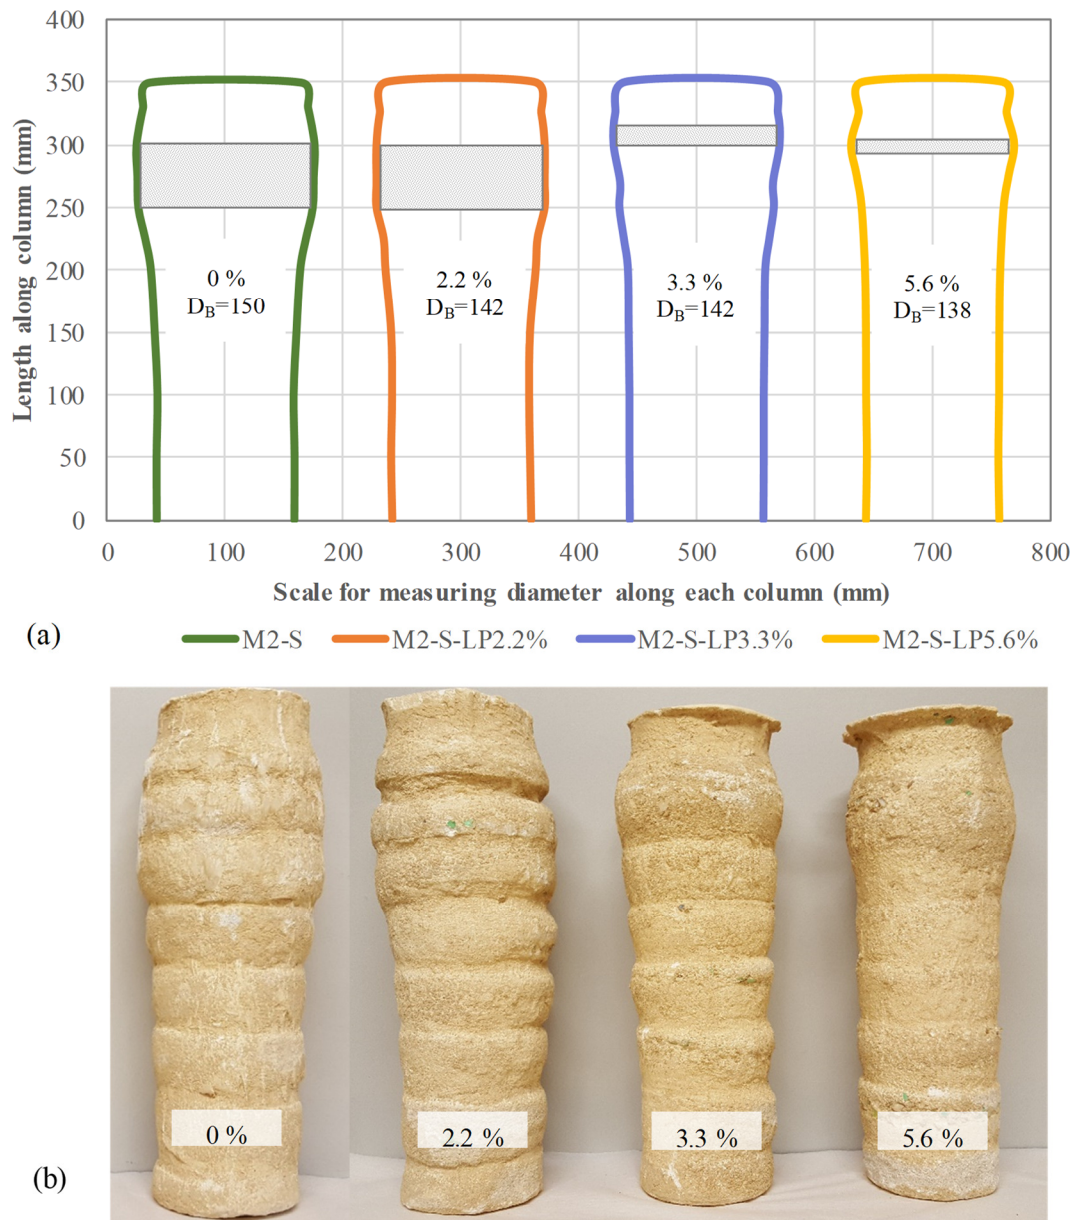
Deformations of tested columns reinforced with layers of PET flakes, and installed in a base silt at LL, (a) graphical plot and (b) pictorial illustration
